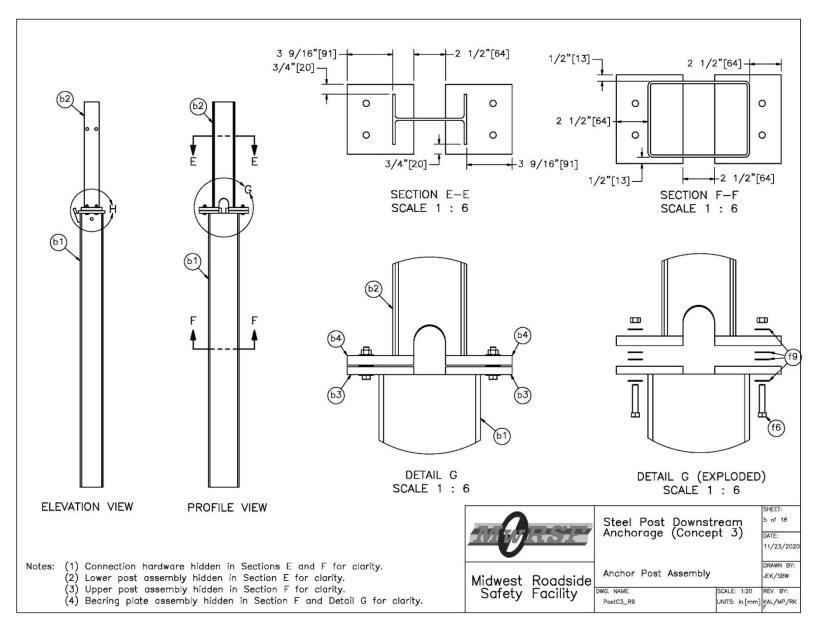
Anchor Post Assembly, Test No. SPDA-3
